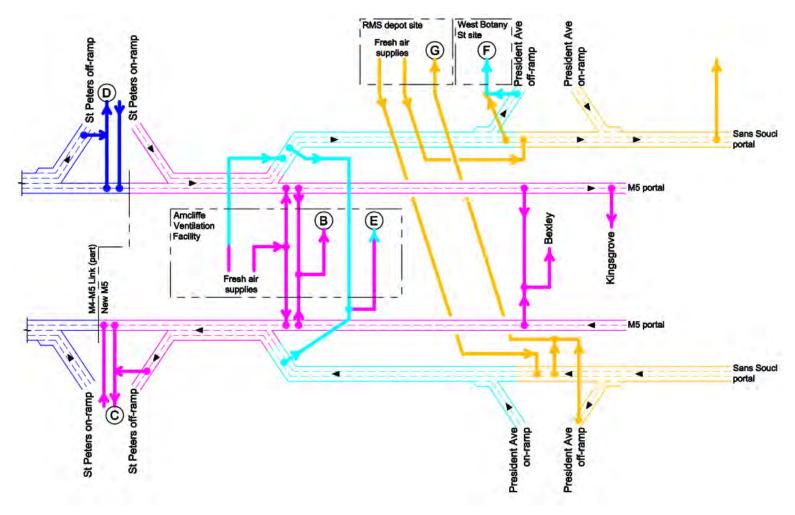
F6 Extension and New M5 tunnel ventilation schematic.
